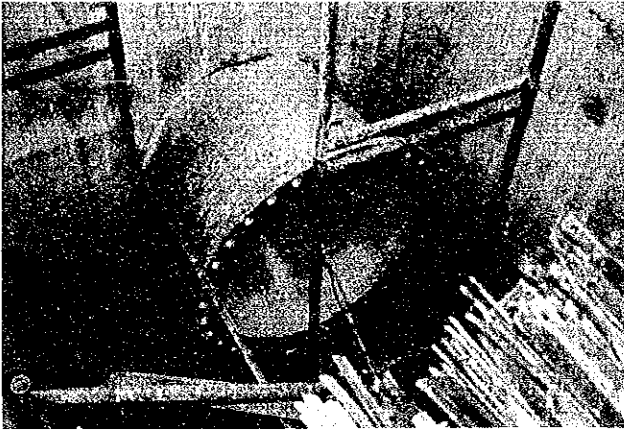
Ductile cast iron pipe rigidly connected to the structural wall
